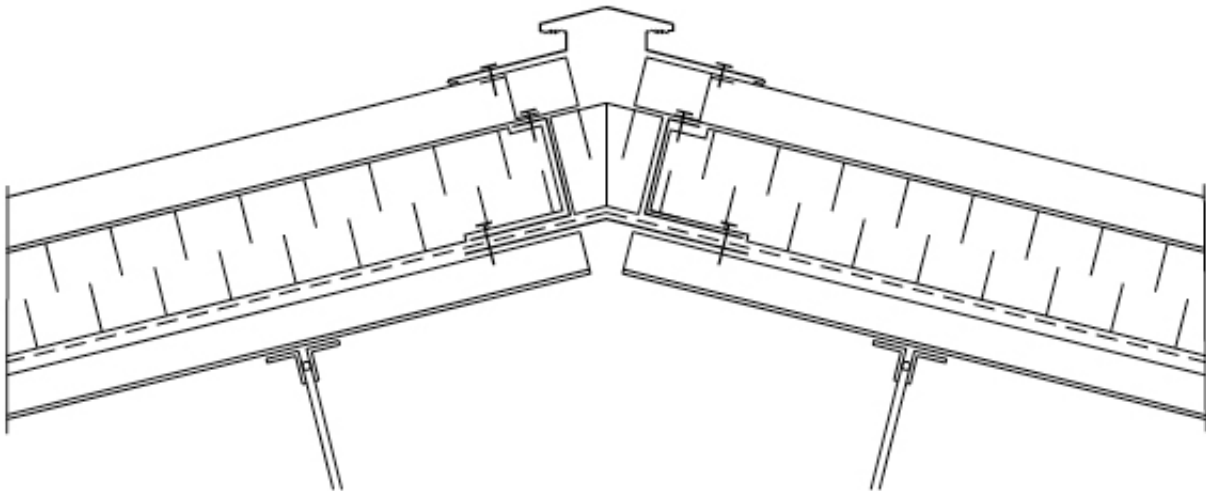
B: Ridge - FixedInstallation/Assembly Notes:
